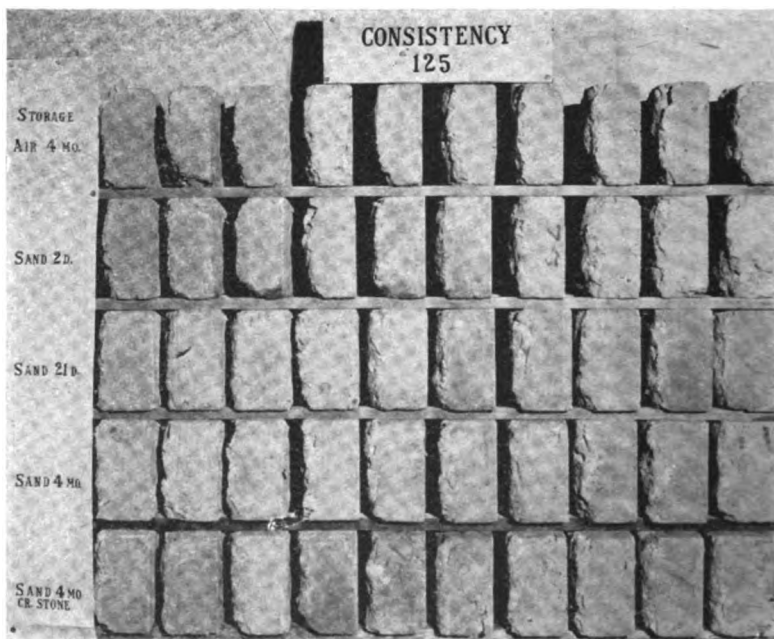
SIDE VIEW OF WEAR BLOCKS AFTER TEST.
